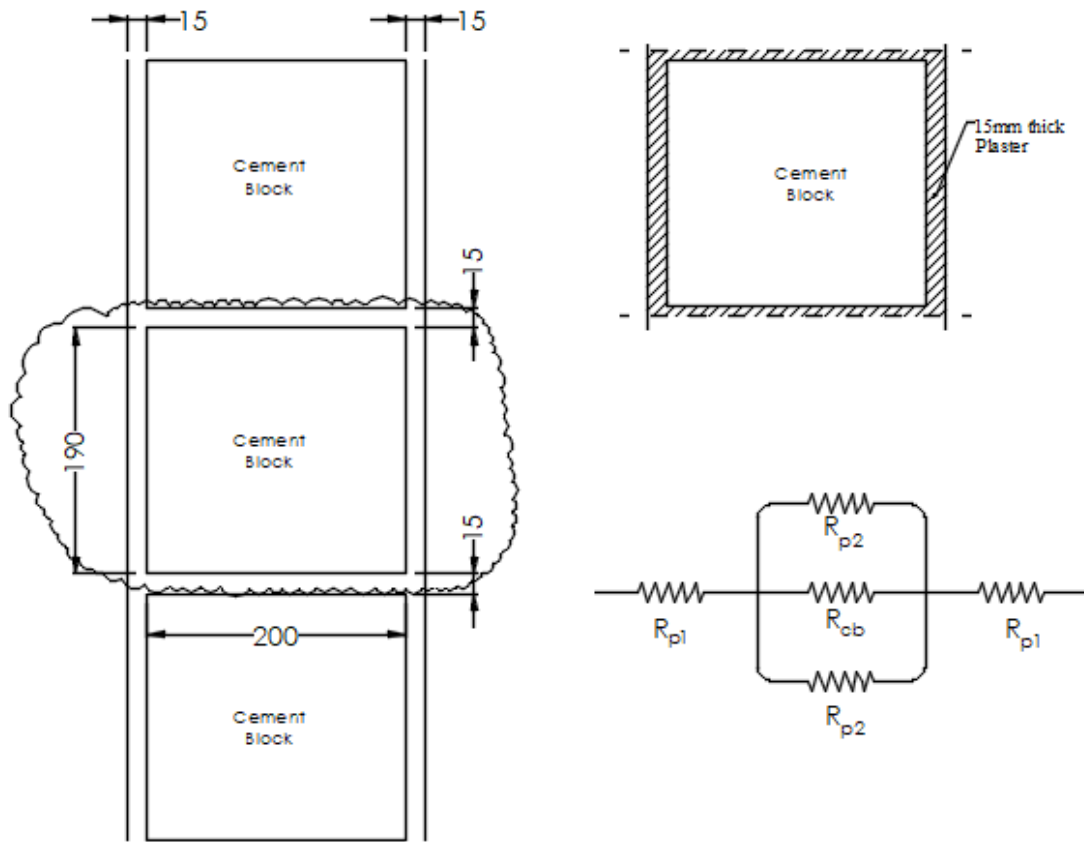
Details of a cross-section – 200mm thick cement block wall.
